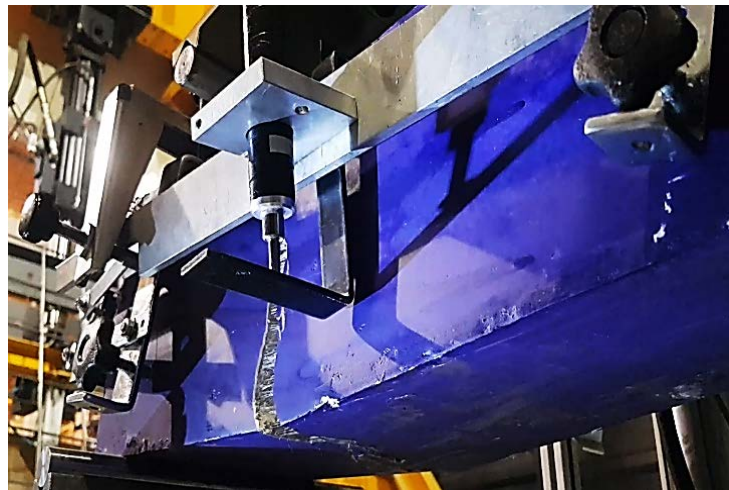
Crack in concrete beam reinforced with 2.5% polypropylene fibers. Source: Authors.
